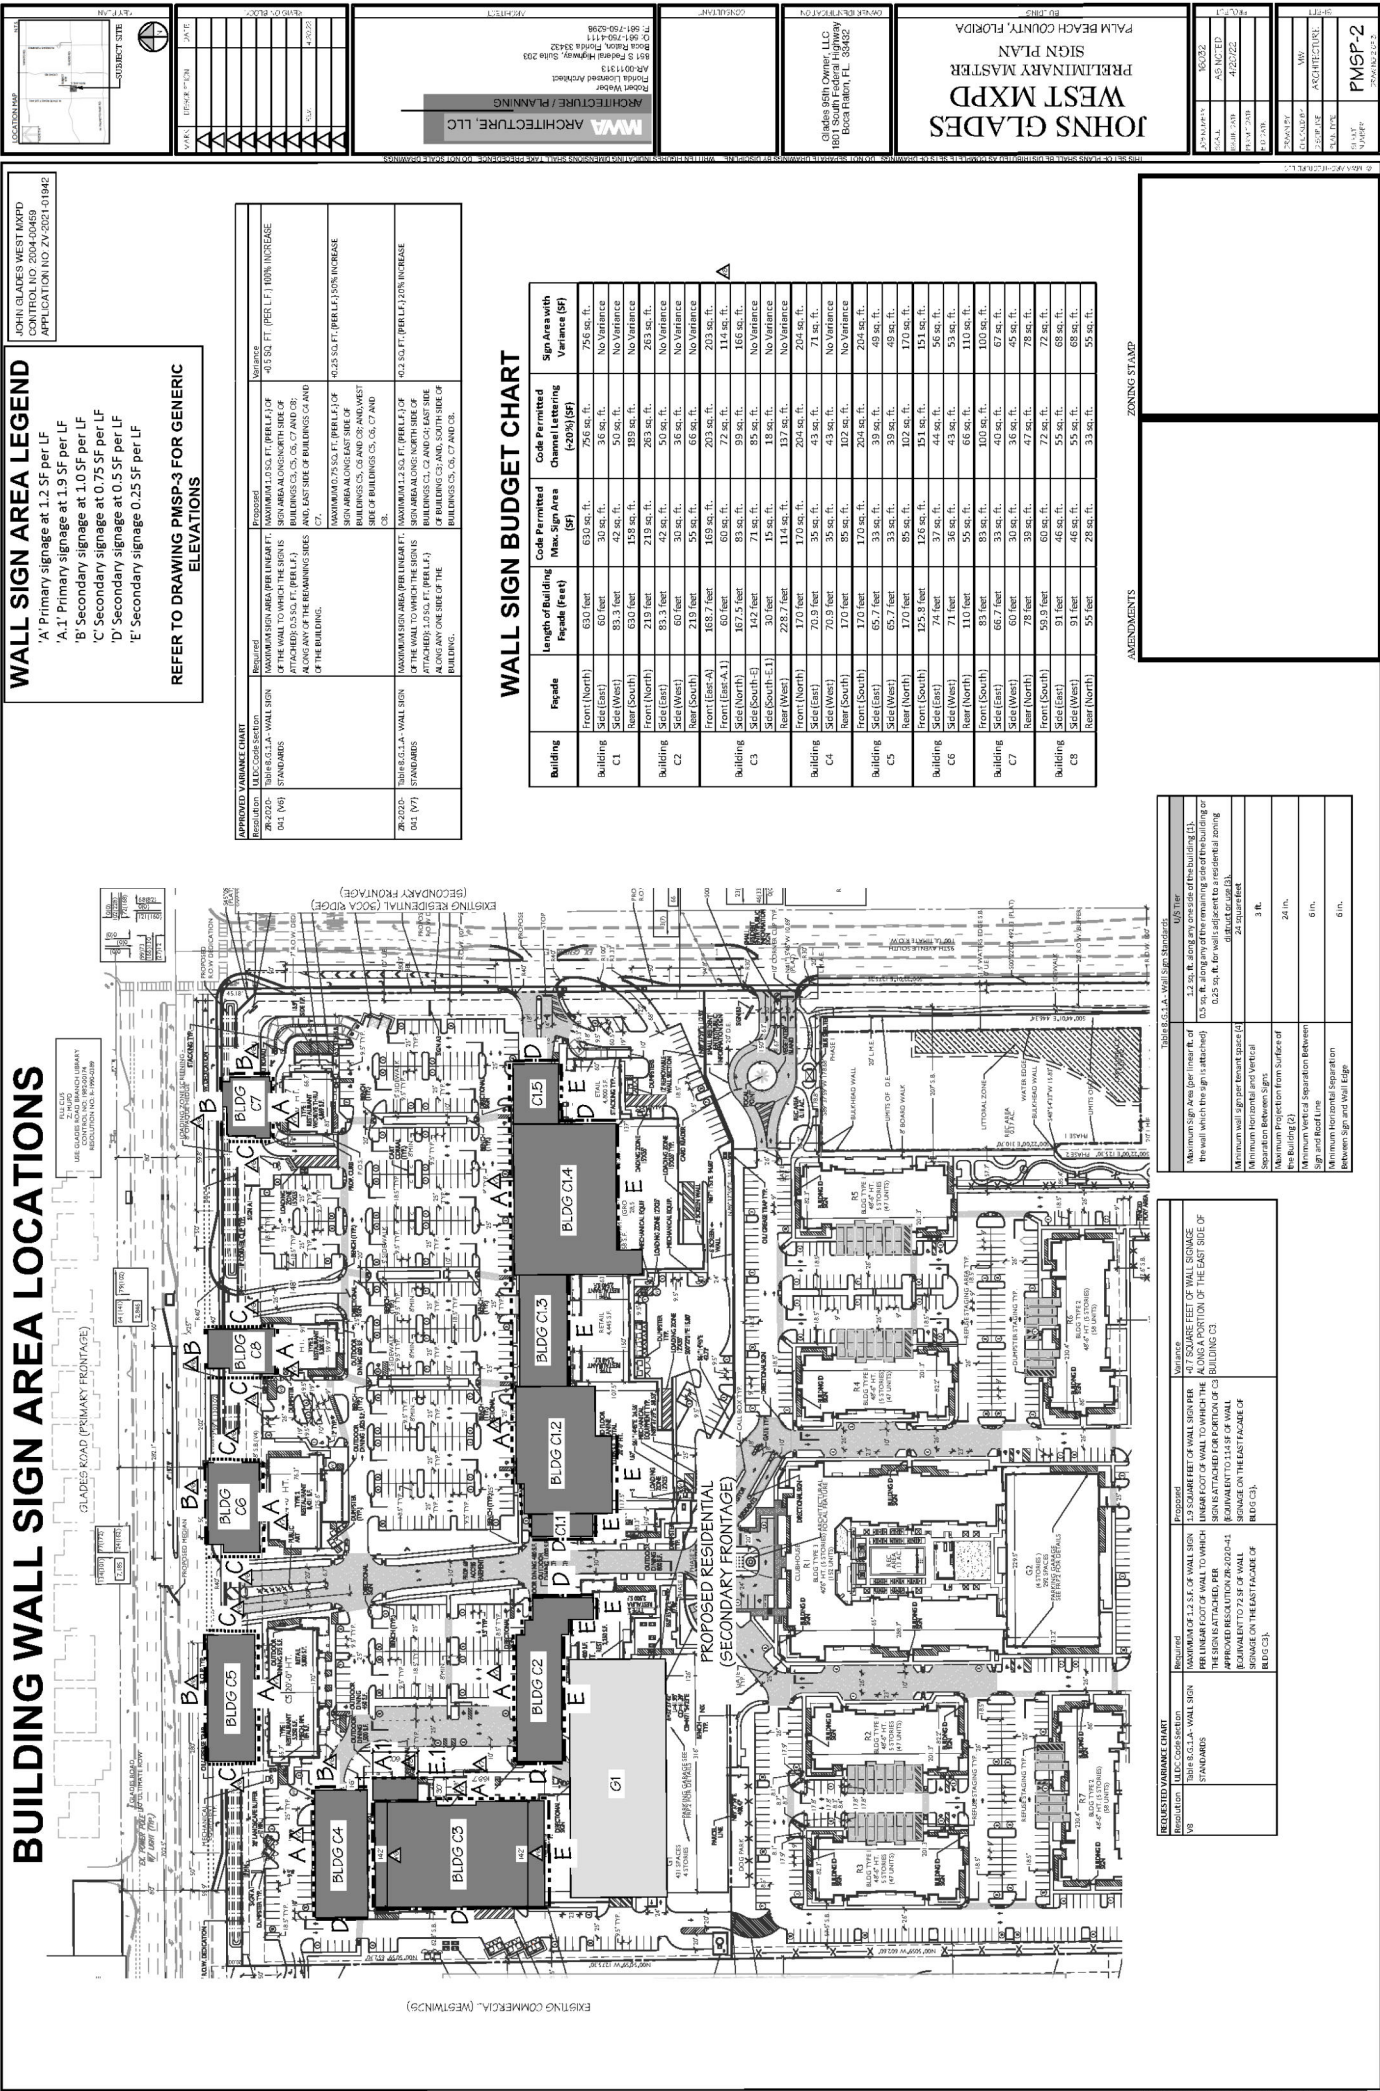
Preliminary Master Sign Plan (Sheet 2 of 3) dated May 2, 2022
